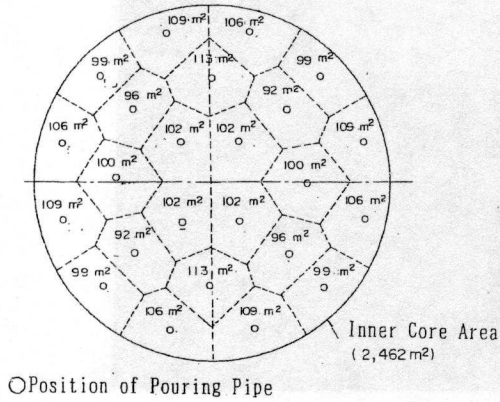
Layout of Pouring Pipe and Concreting Apparatus on the Caisson
